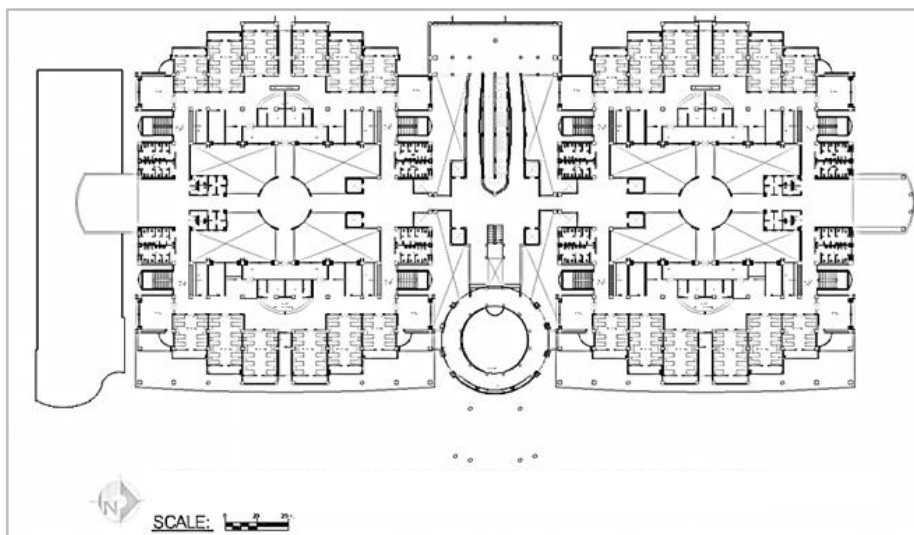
All Floor Plans of Hospital 'E' (Hussain, 1988)
